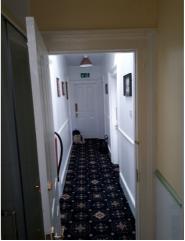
Staircase to second floor level (L), where a central hallway provides access to several bedrooms.
